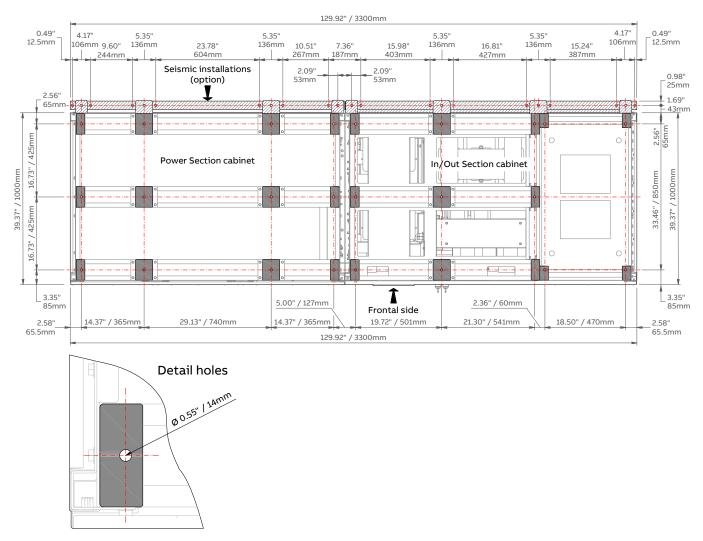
MegaFlex 1000 to 1600 - UPS cabinet floor fixing points
